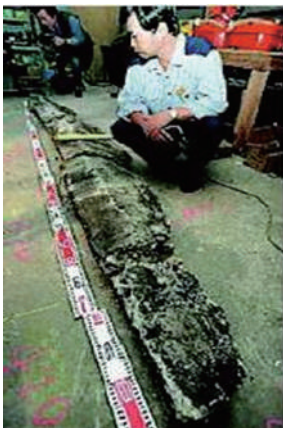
Big piece of concrete fell down from tunnel wall (Mainichi news paper)
